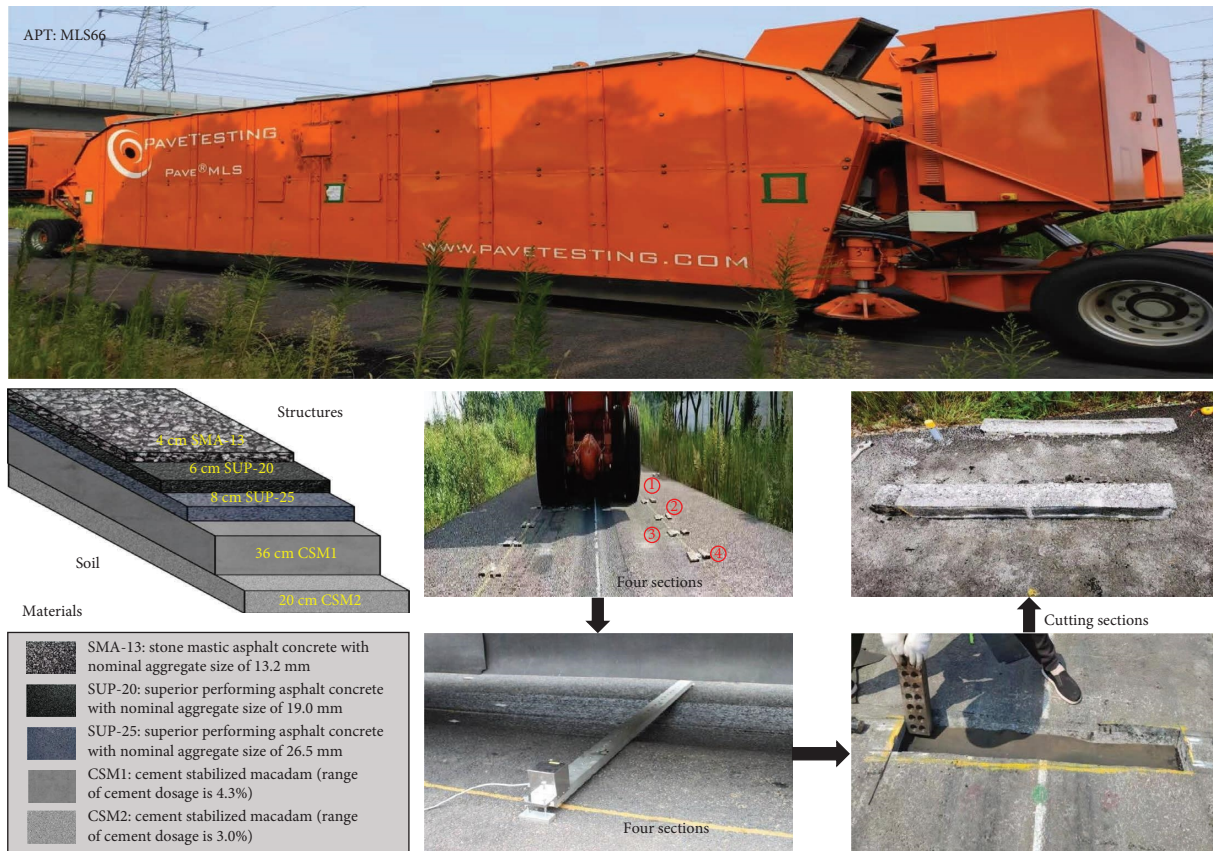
Diagram of road structures, rutting measurement, and accelerated pavement tests.
